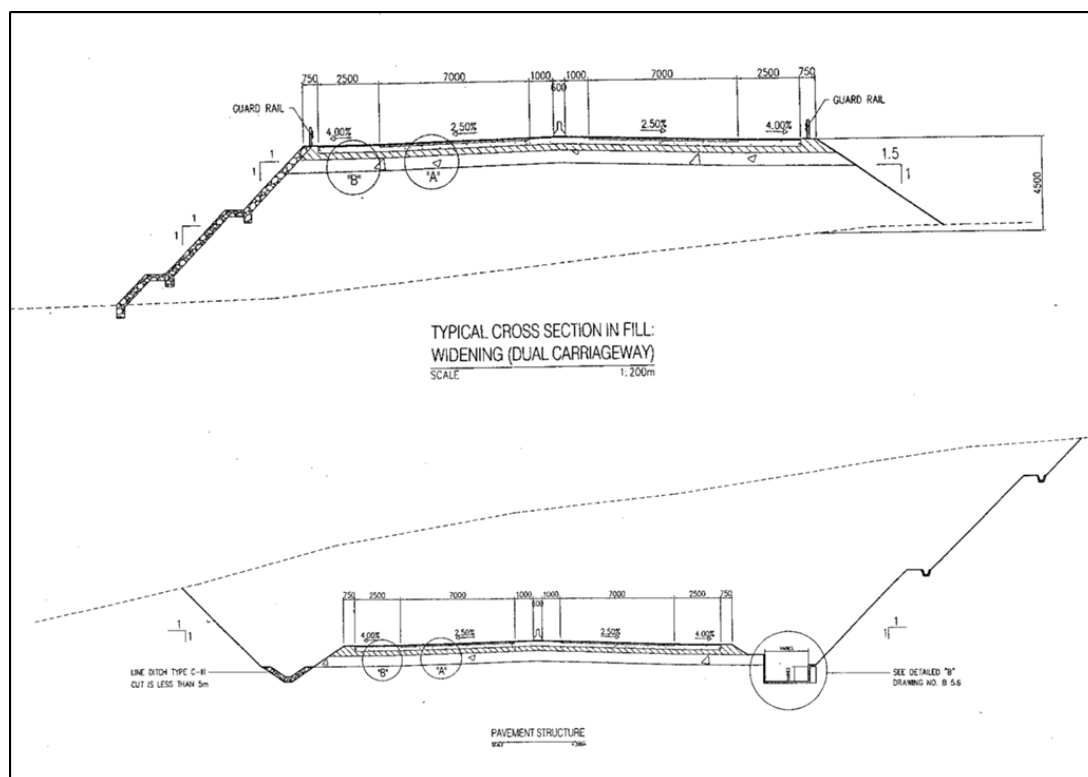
Typical Road Cross Section (4 Lanes) Project
